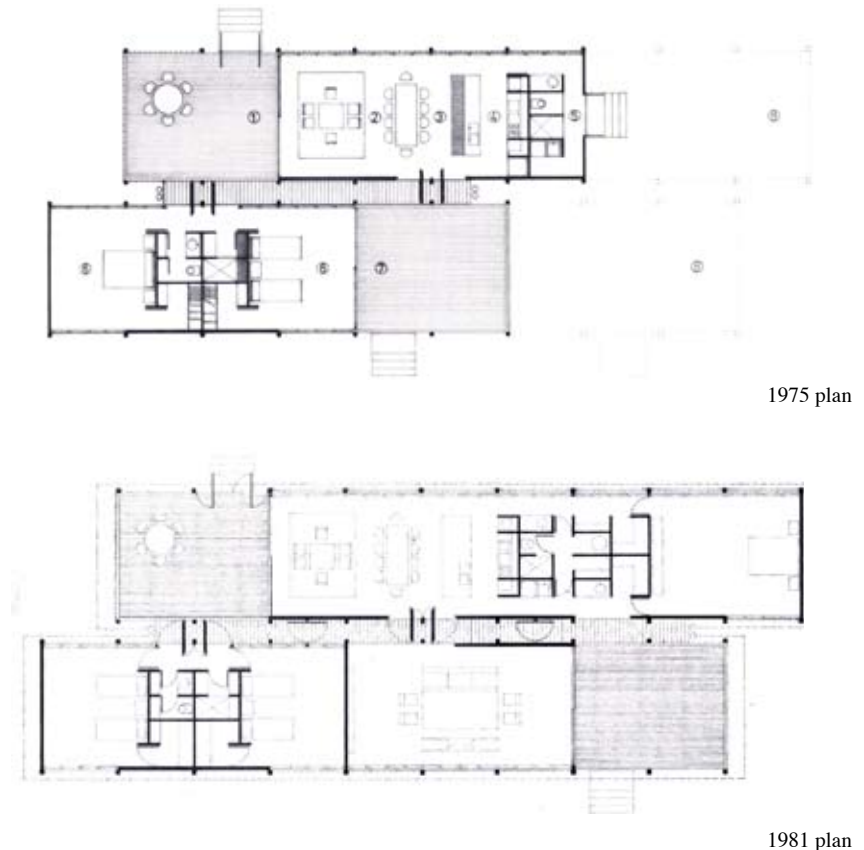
1975 original plan and 1981 adapted plan of Marie Short House
